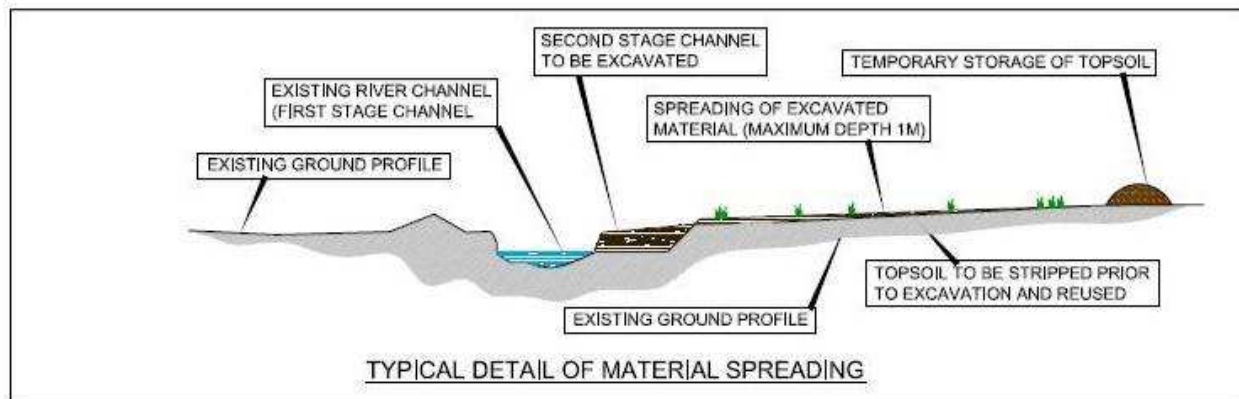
Typical Detail of Landspreading of Excavated Materials
